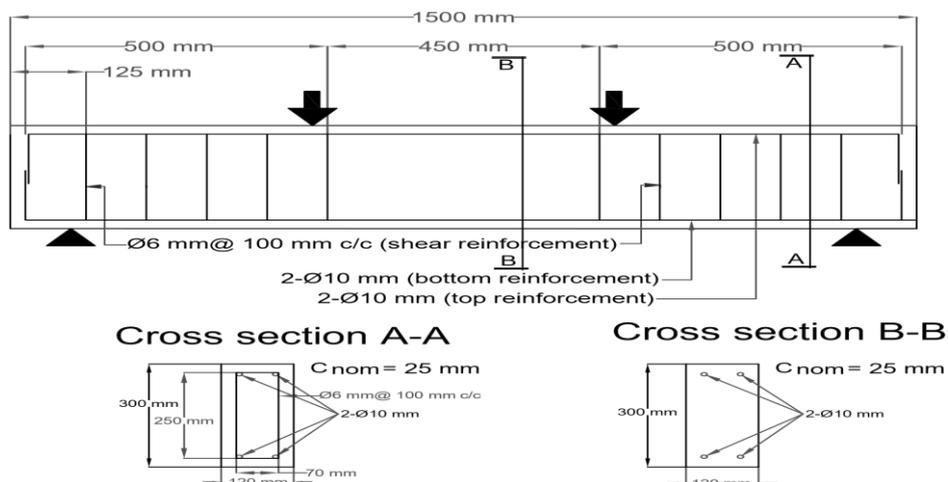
Arrangement of reinforcement bars in solid RC beam
